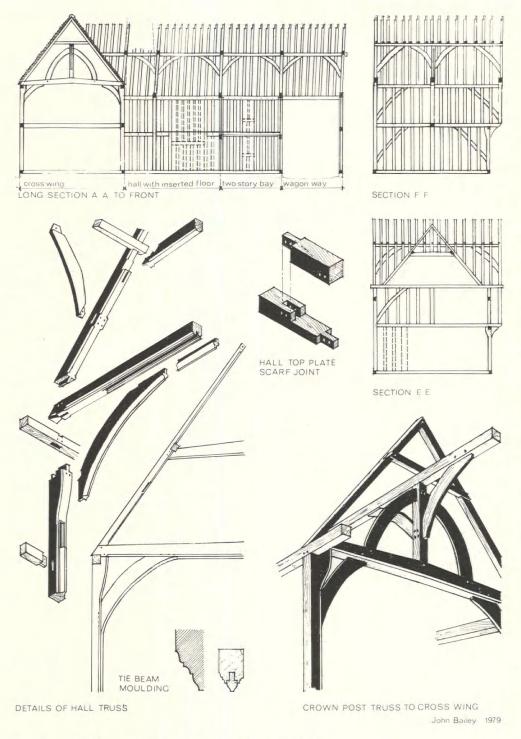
Sun House, Potton: sections and framing details. Scale for sections as figure 6.
